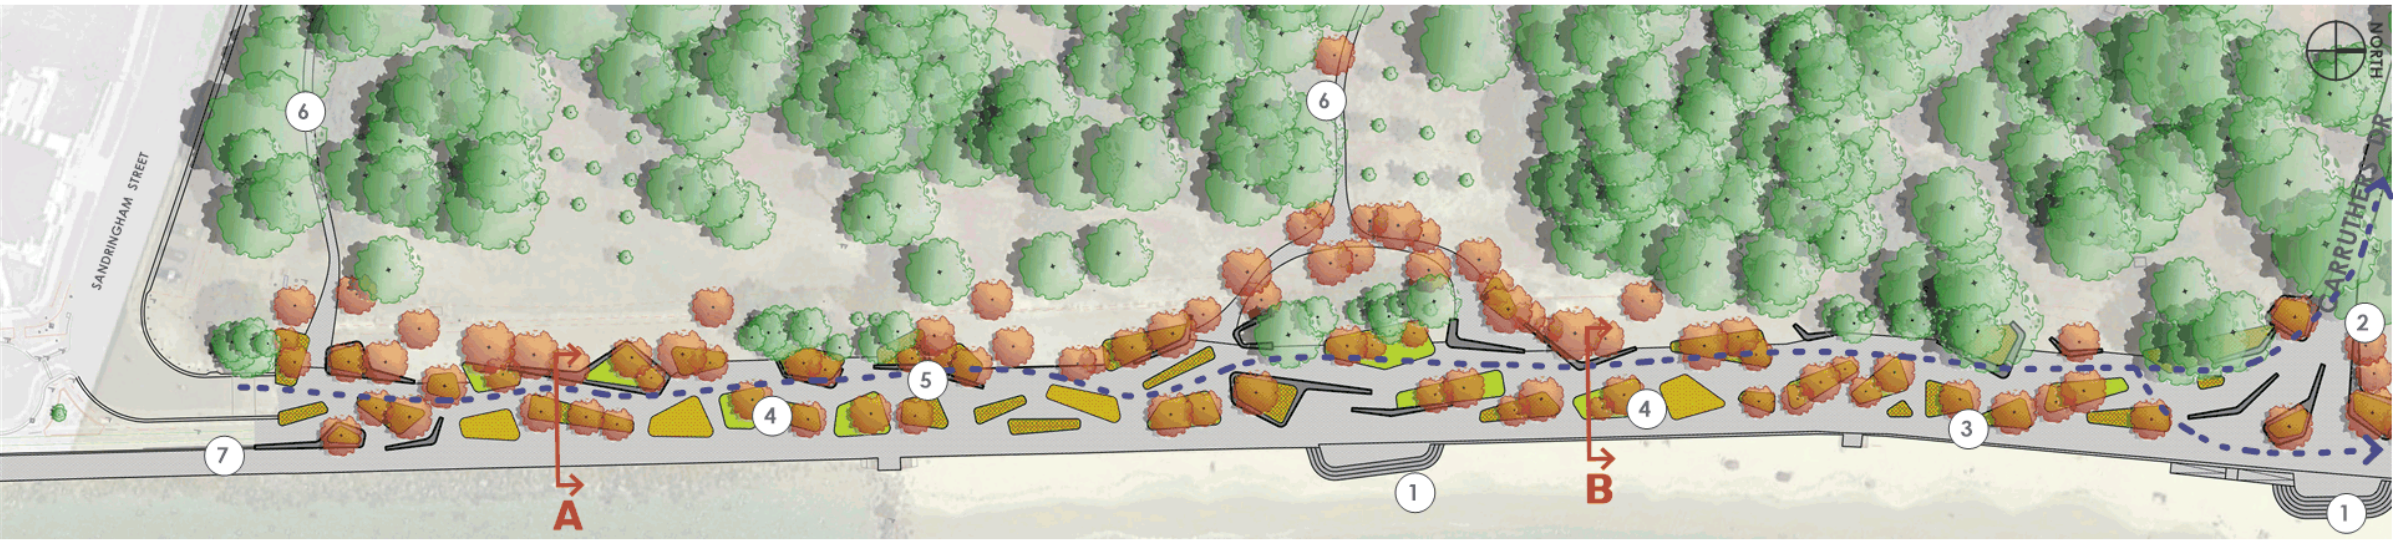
Plan of waterfront promenade – south (Scale 1:1000)
